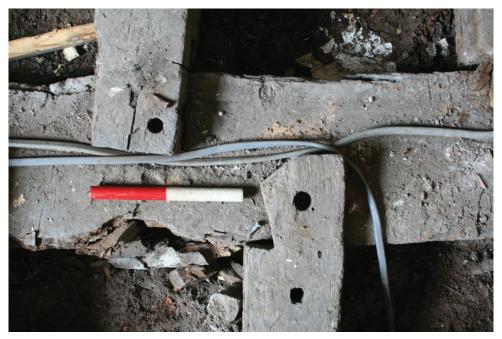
Beam and joist detail near the fireplace (0.2m scale).
